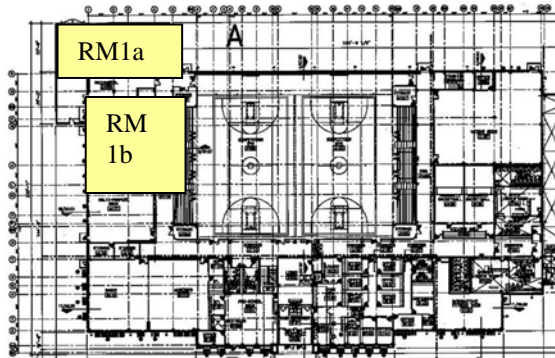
Rec Center 1st Floor Mechanical Room Locations
